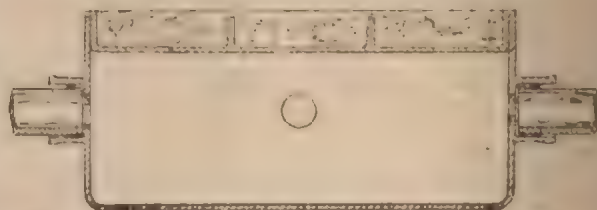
Drawing In and Joint Box. Silvertown System.
